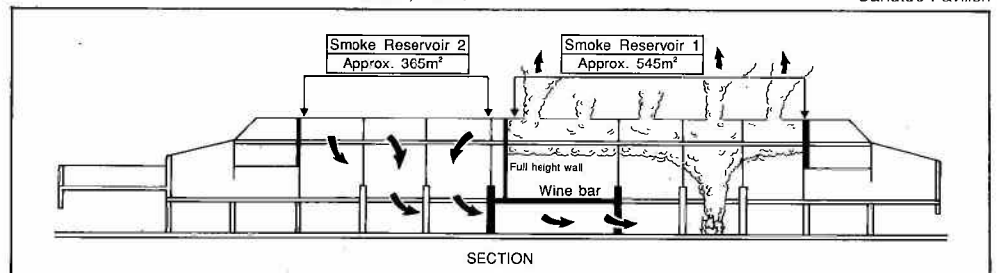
Venting arrangement for smoke control at Canute's Pavilion
